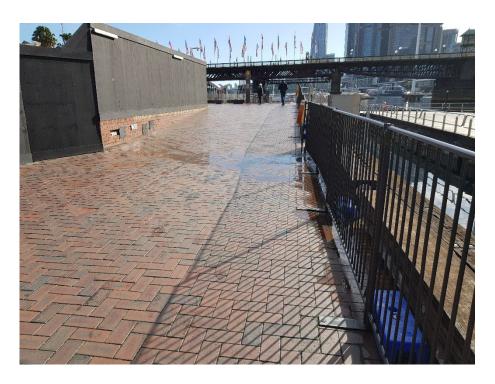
Public way along the eastern site boundary with hoarding, looking towards Pyrmont Bridge. Minor water seepage from the site draining towards Cockle Bay on the right.
